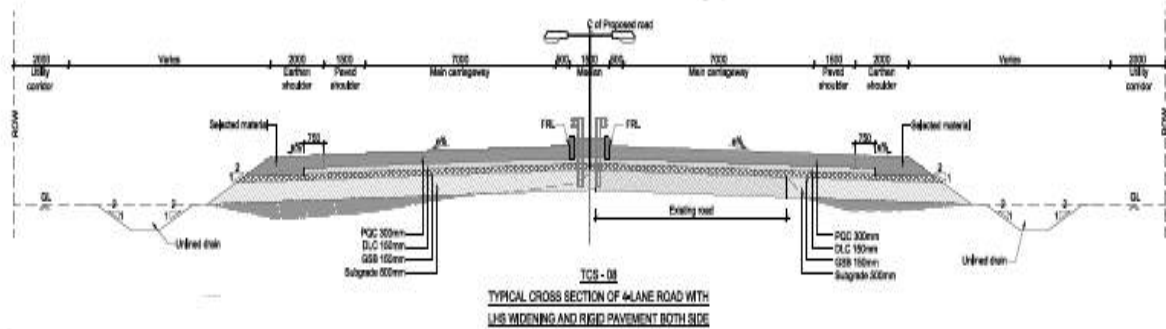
TCS-8 4-lane road with LHS widening and rigid pavement both side
